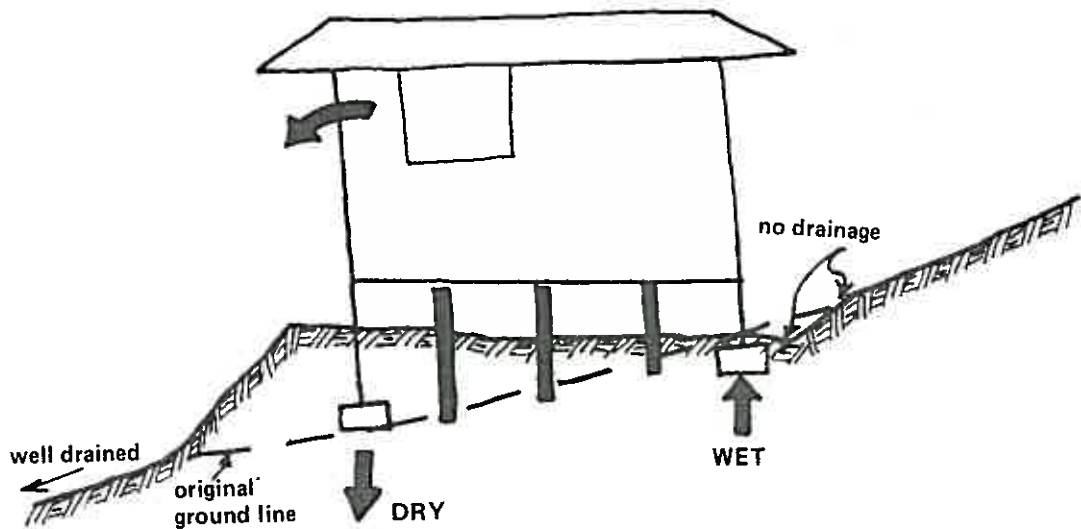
Cut and fill site with poor drainage of the face of the cut.
